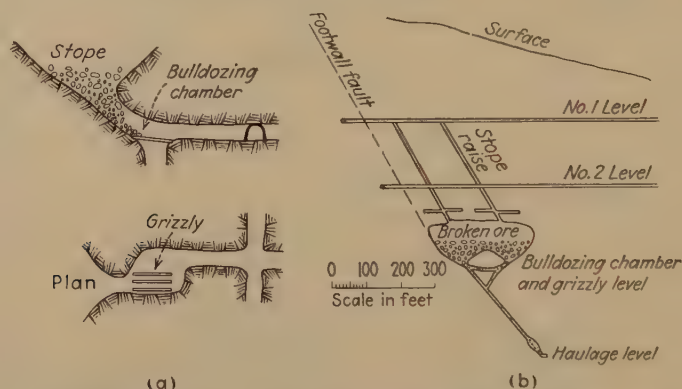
STANDARD BULLDOZING CHAMBER (a) AND CROSS-SECTION OF STOPE (b) AT ALASKA JUNEAU MINE.
